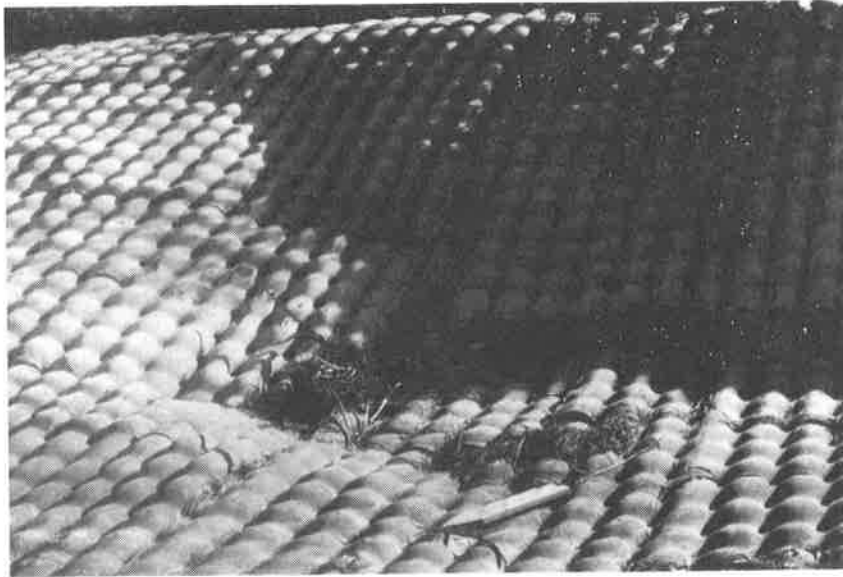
Example of Erosion Control Structural Problem Caused by Failure of Geotextile Underlying Fabric-Formed Concrete
